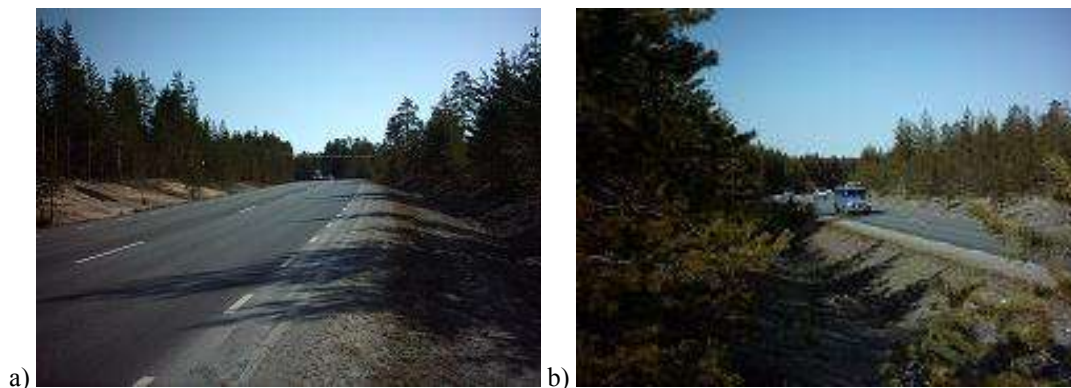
a) Stretch of road 968 b) View from measure point M 968
